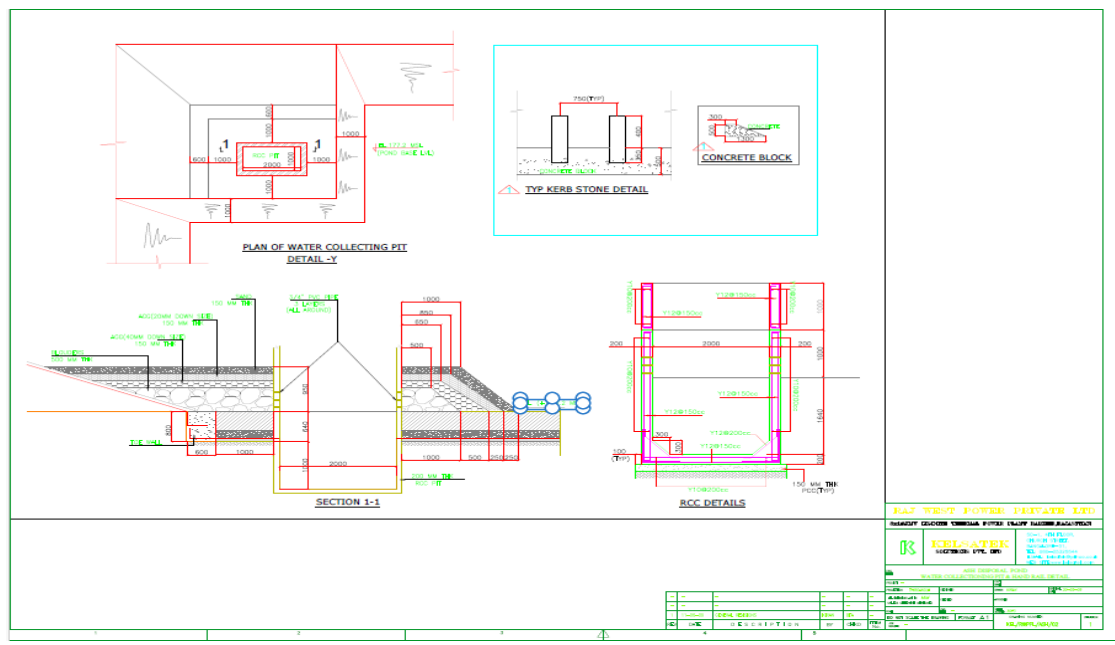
ASH DISPOSAL POND- WATER COLLECTIONING PIT AND HAND RAIL DETAIL
